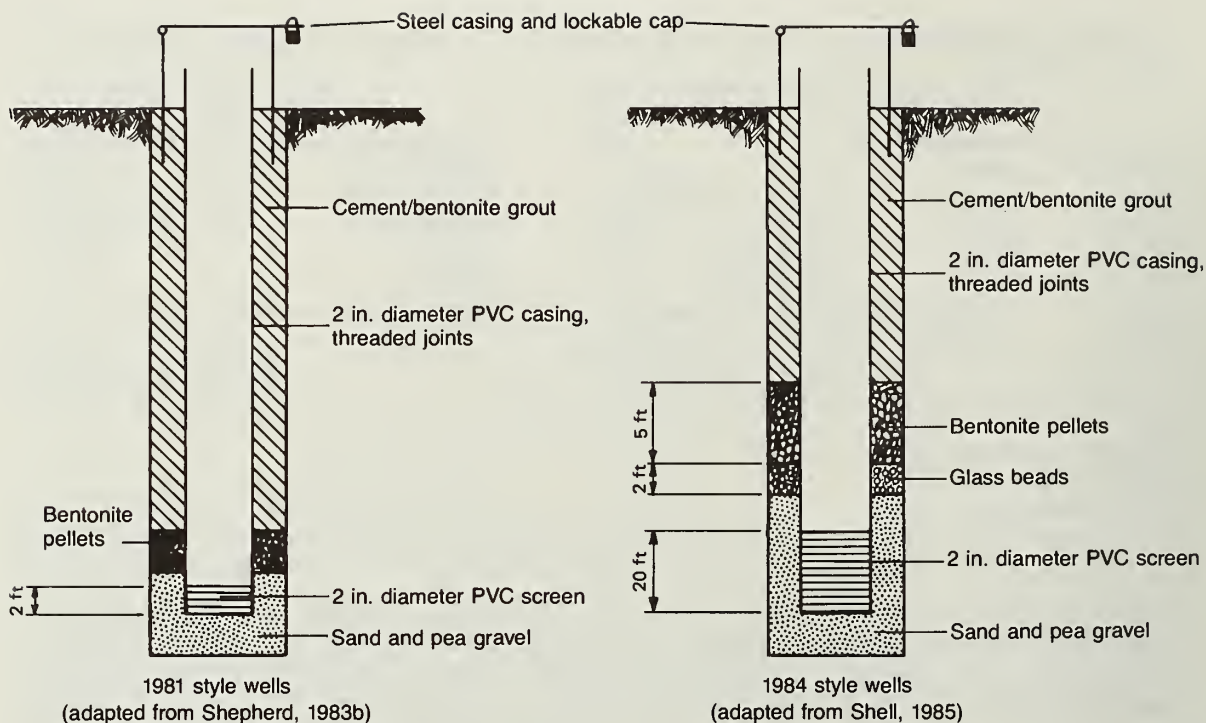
Typical construction of monitoring wells at Shell Manufacturing Complex.
